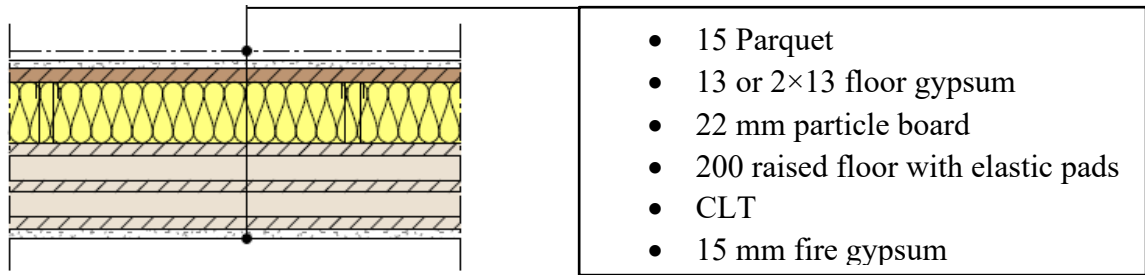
Floor structure 1 – CLT with raised floor on resilient pads.
